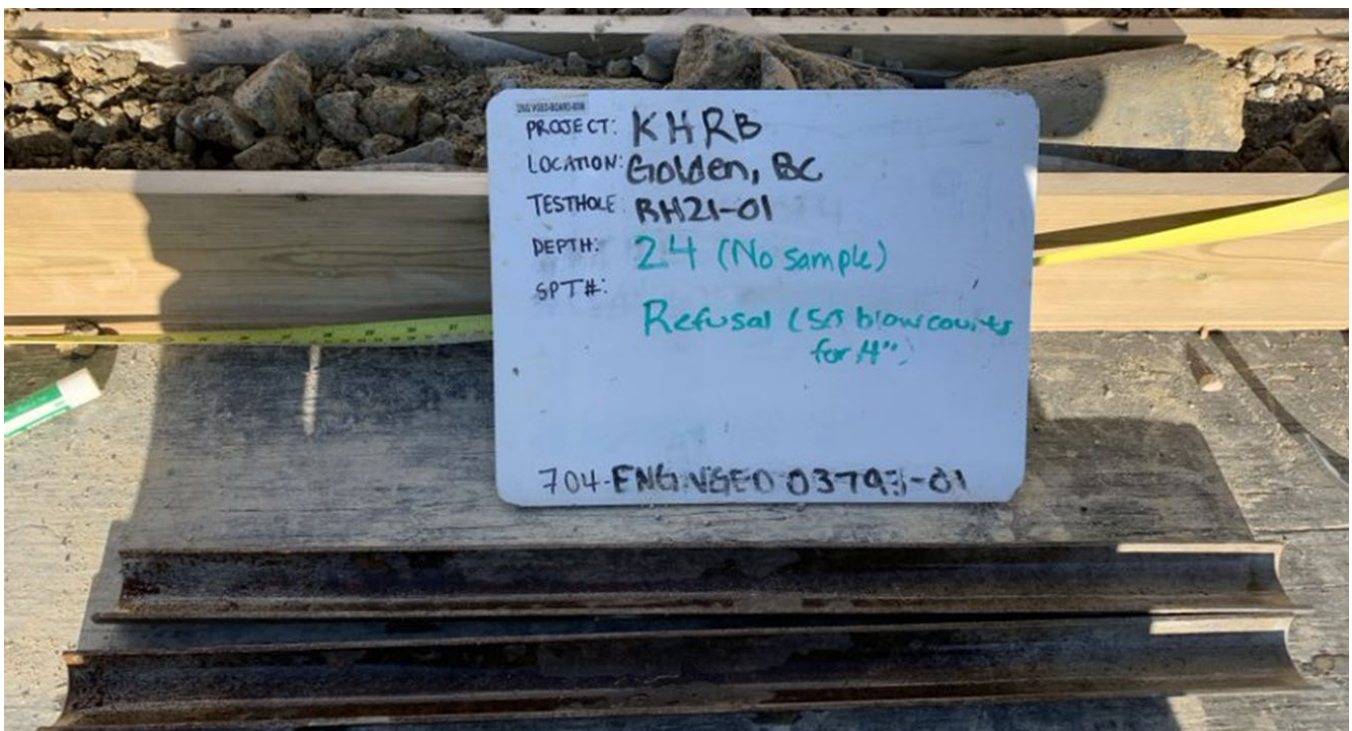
BH21-01, SPT-12, 24.0 m to 24.5 m
